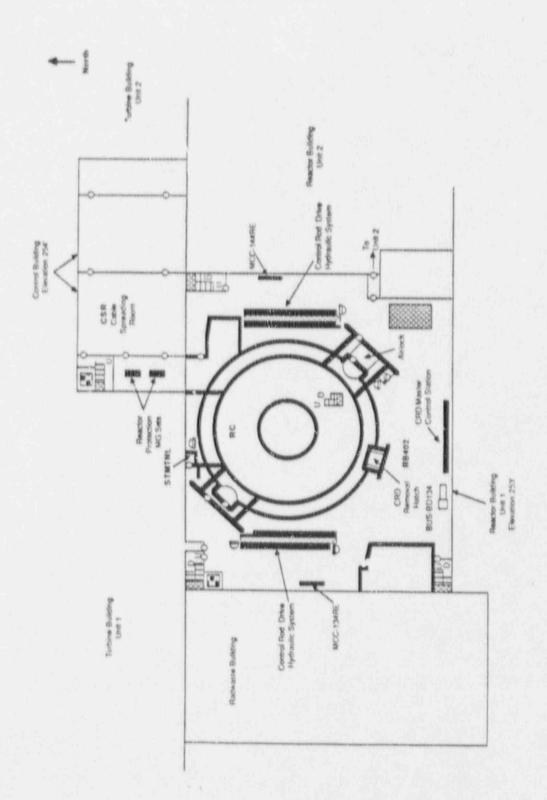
Limerick 1 General Arrangement, Elevations 253' and 254'
